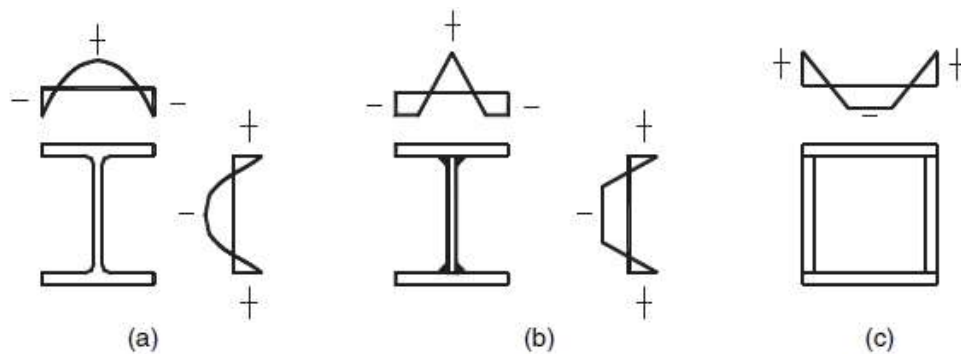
Typical distribution of residual stresses for steel members (a) hot-rolled H-type section; (b) welded H-type section; (c) welded box section (Li and Li, 2007)
